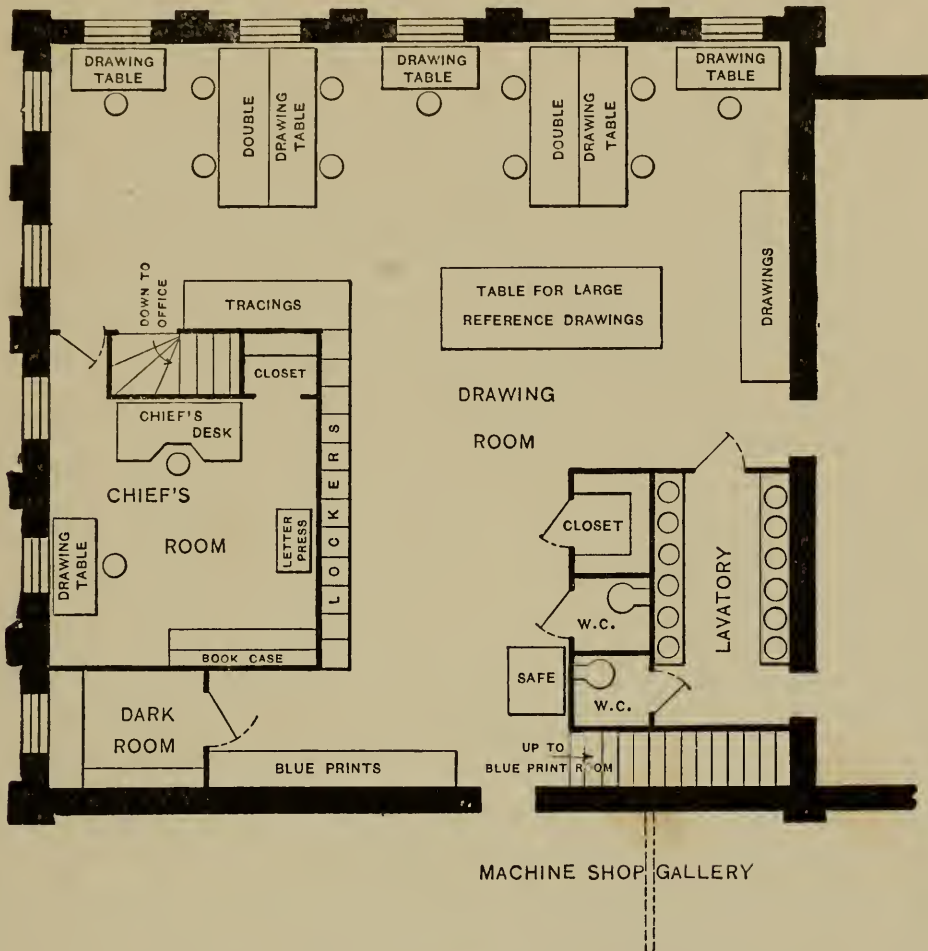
Plan of the Drawing Room and its Arrangement.
